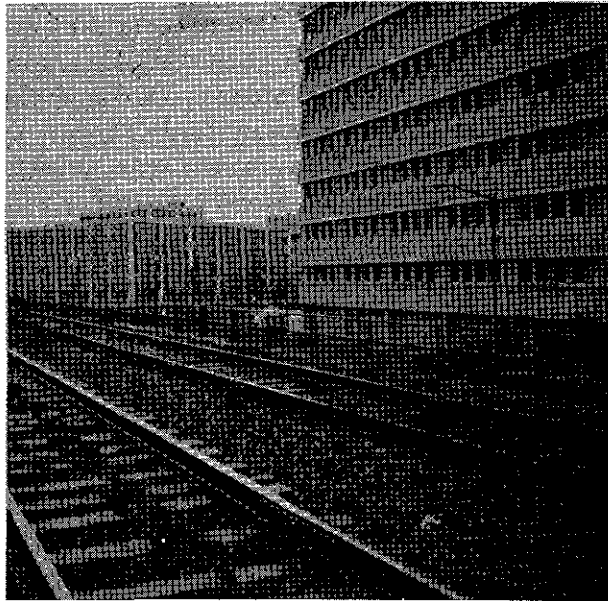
Track structure and retaining wall on east side at the scene of the accident.
